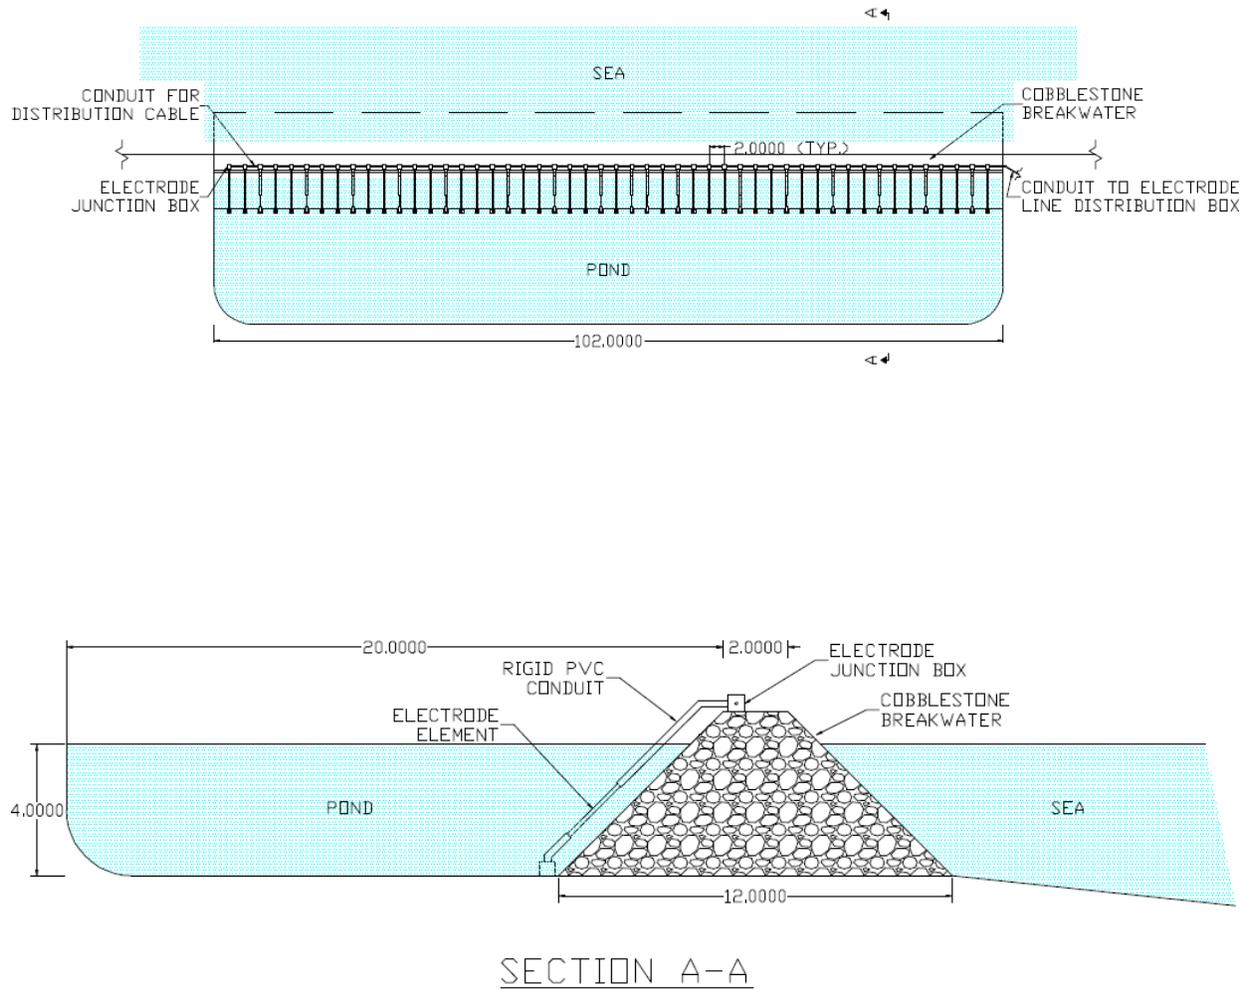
HVdc Shoreline Pond Electrode Plan and Section
